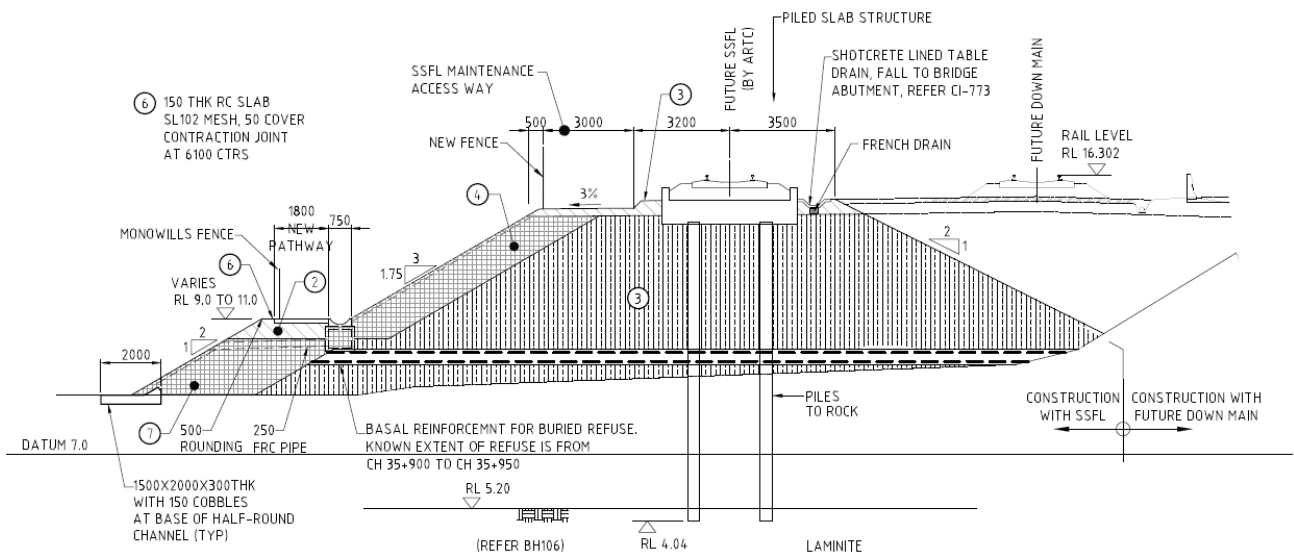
Typical Cross Section through Piled Slab with Embankment Support.
